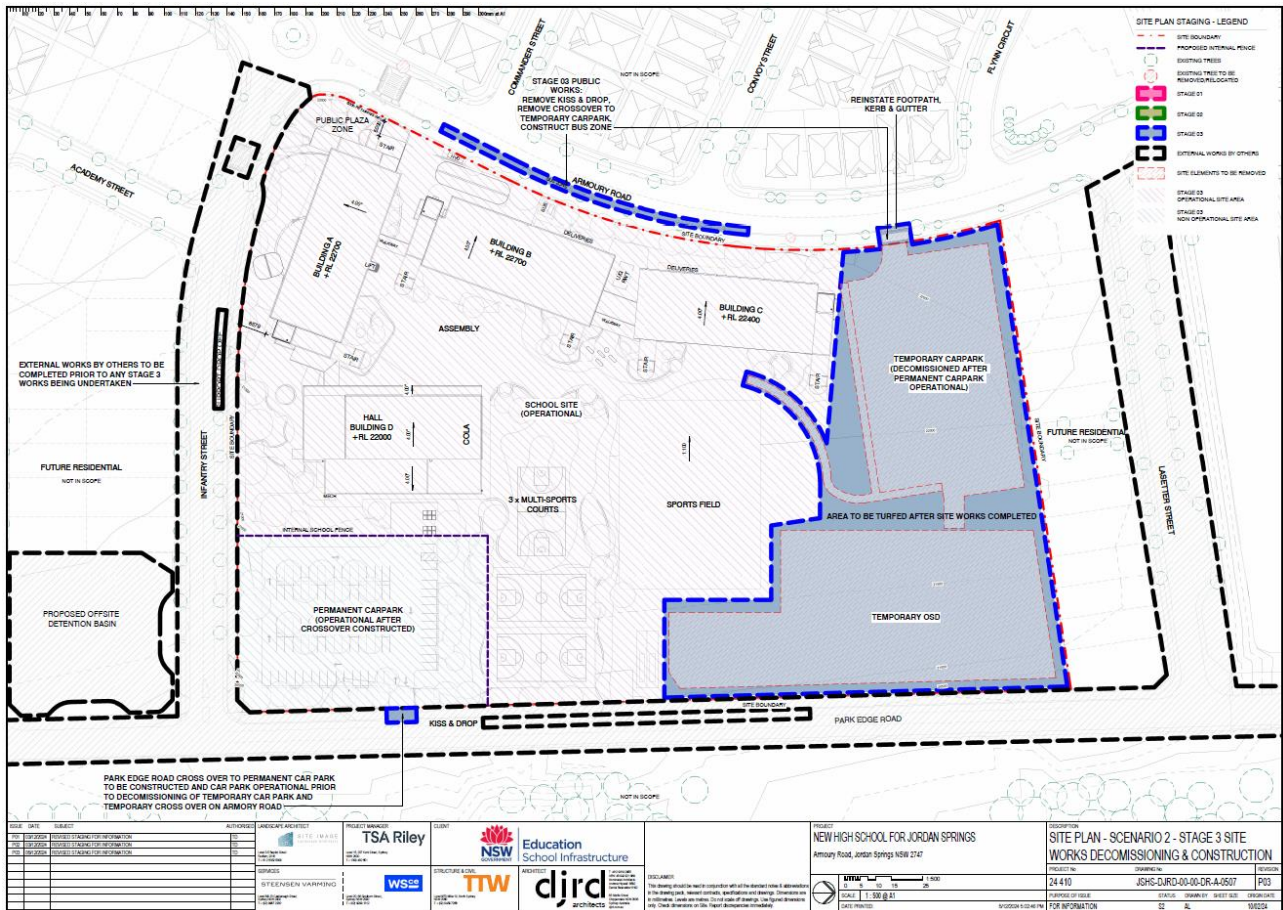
New High School for Jordan Springs Scenario 2 – Stage 3 Site Works Decommissioning & Construction Plan (Source: DJRD, issue date 05 December 2024)
